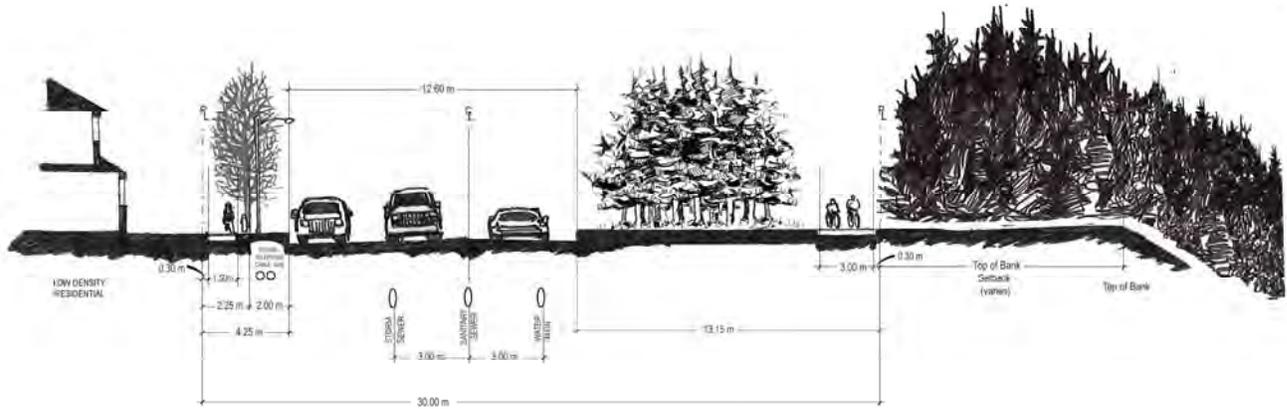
Cross section of Firebreak Road; showing pathway in wooded area
